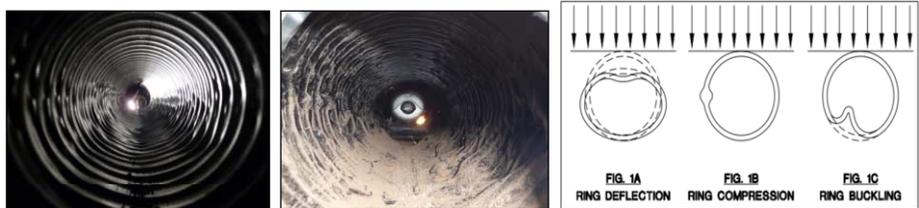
Left image: Typical lateral deformation observed inside the pipes during the tests. Center image: Typical deformation observed inside the pipes after the 400 m height fill test. Right image: Literature failure mechanisms (Ref. [7]).
